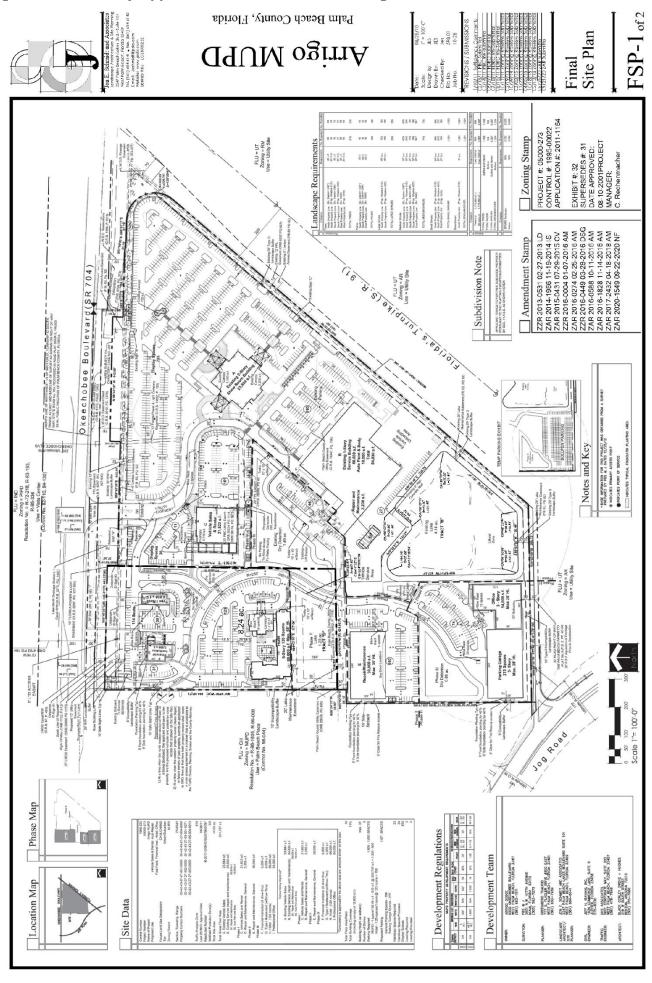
Previously Approved Final Site Plan dated August 10, 2001
